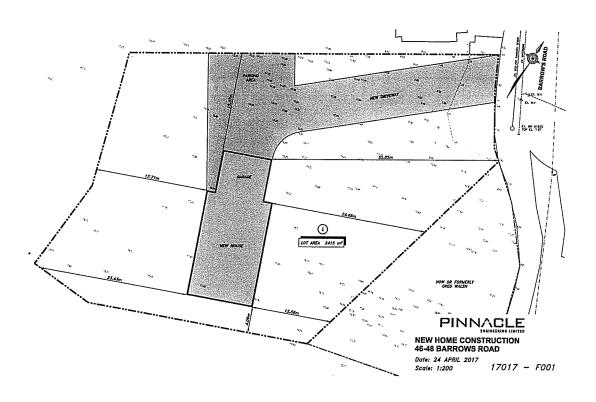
Lot elevation measurements and location of driveway and off-street parking spaces.
